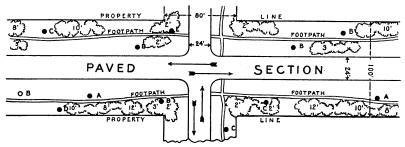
A 100-foot right-of-way with a 24-foot improved roadbed, leaving 38 feet on each side in which informal plantings are placed. The footpaths wind in and out among the plantings. The figures in the groups indicate the appropriate height for the plants.
